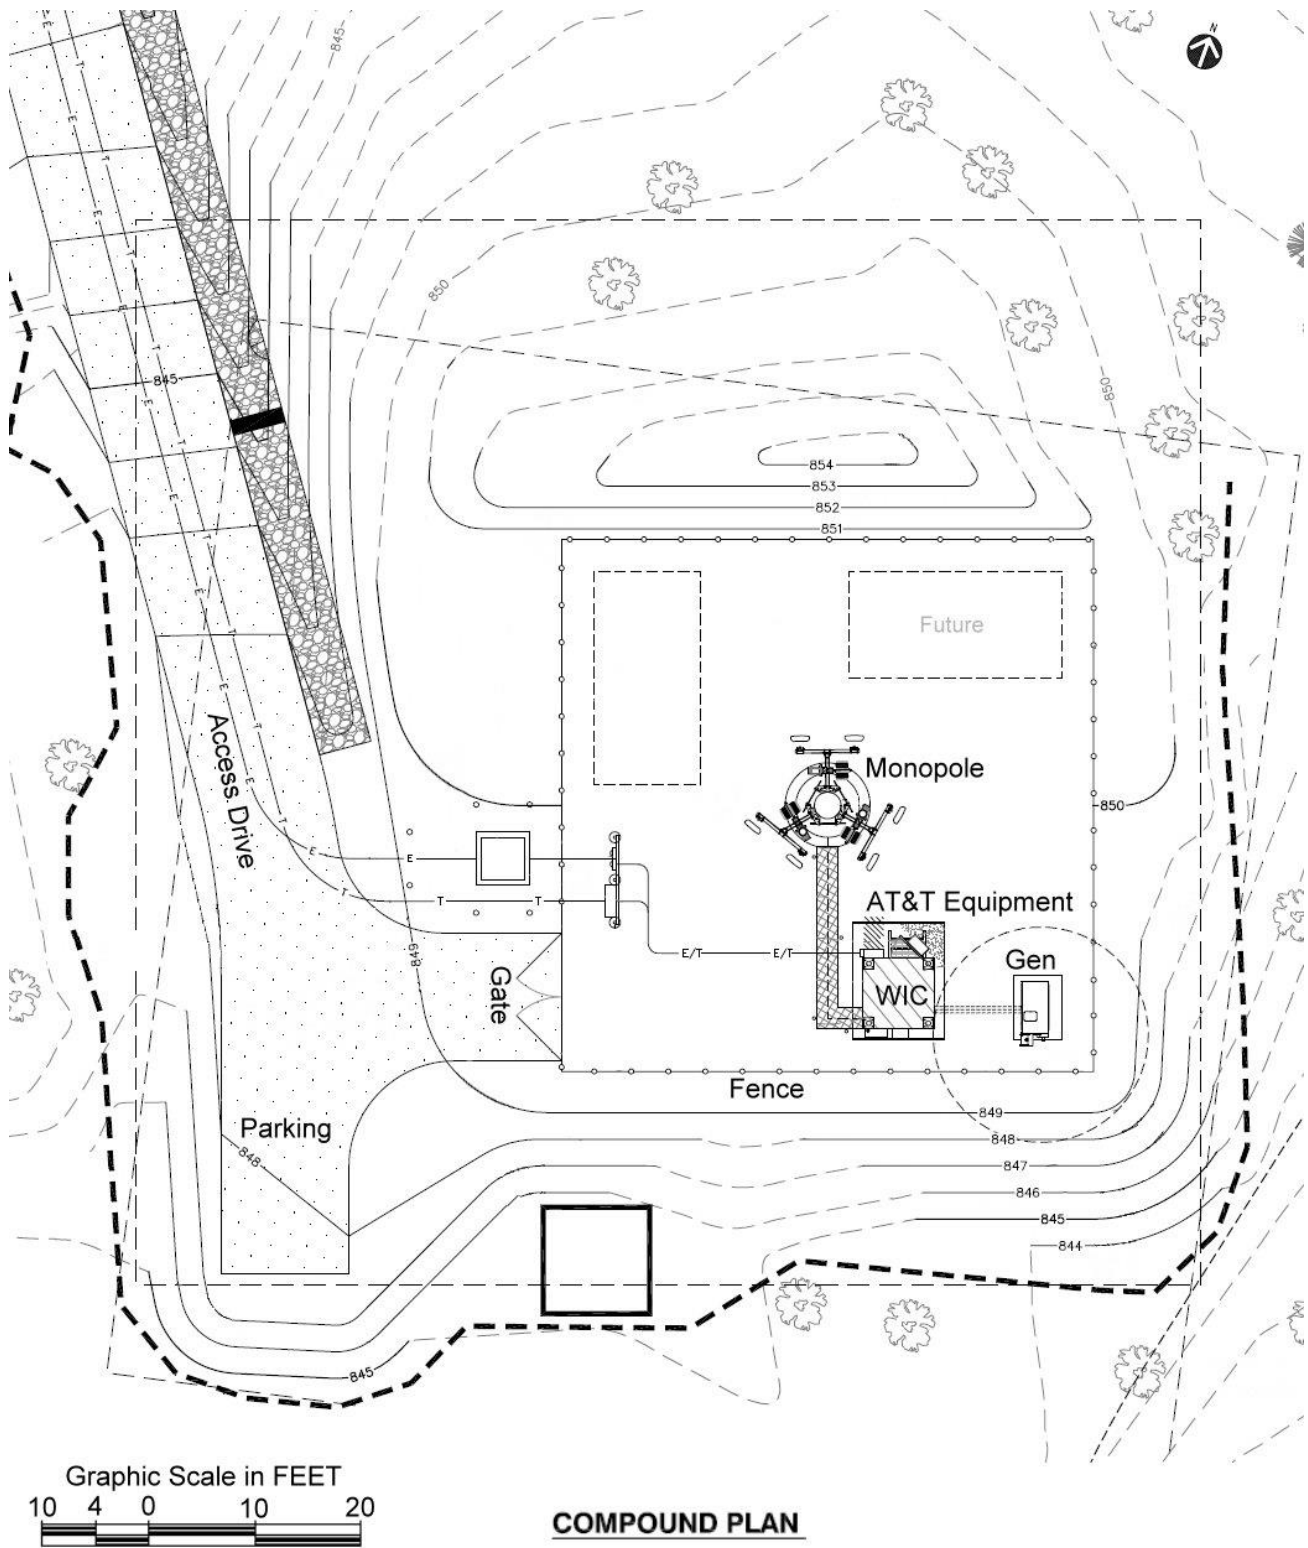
Plan Showing the Proposed Layout of the Equipment Compound
